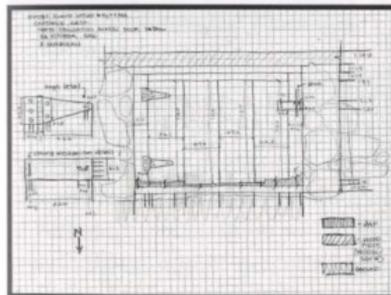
Measured drawing of the wood access door, north elevation, with hardware details.
